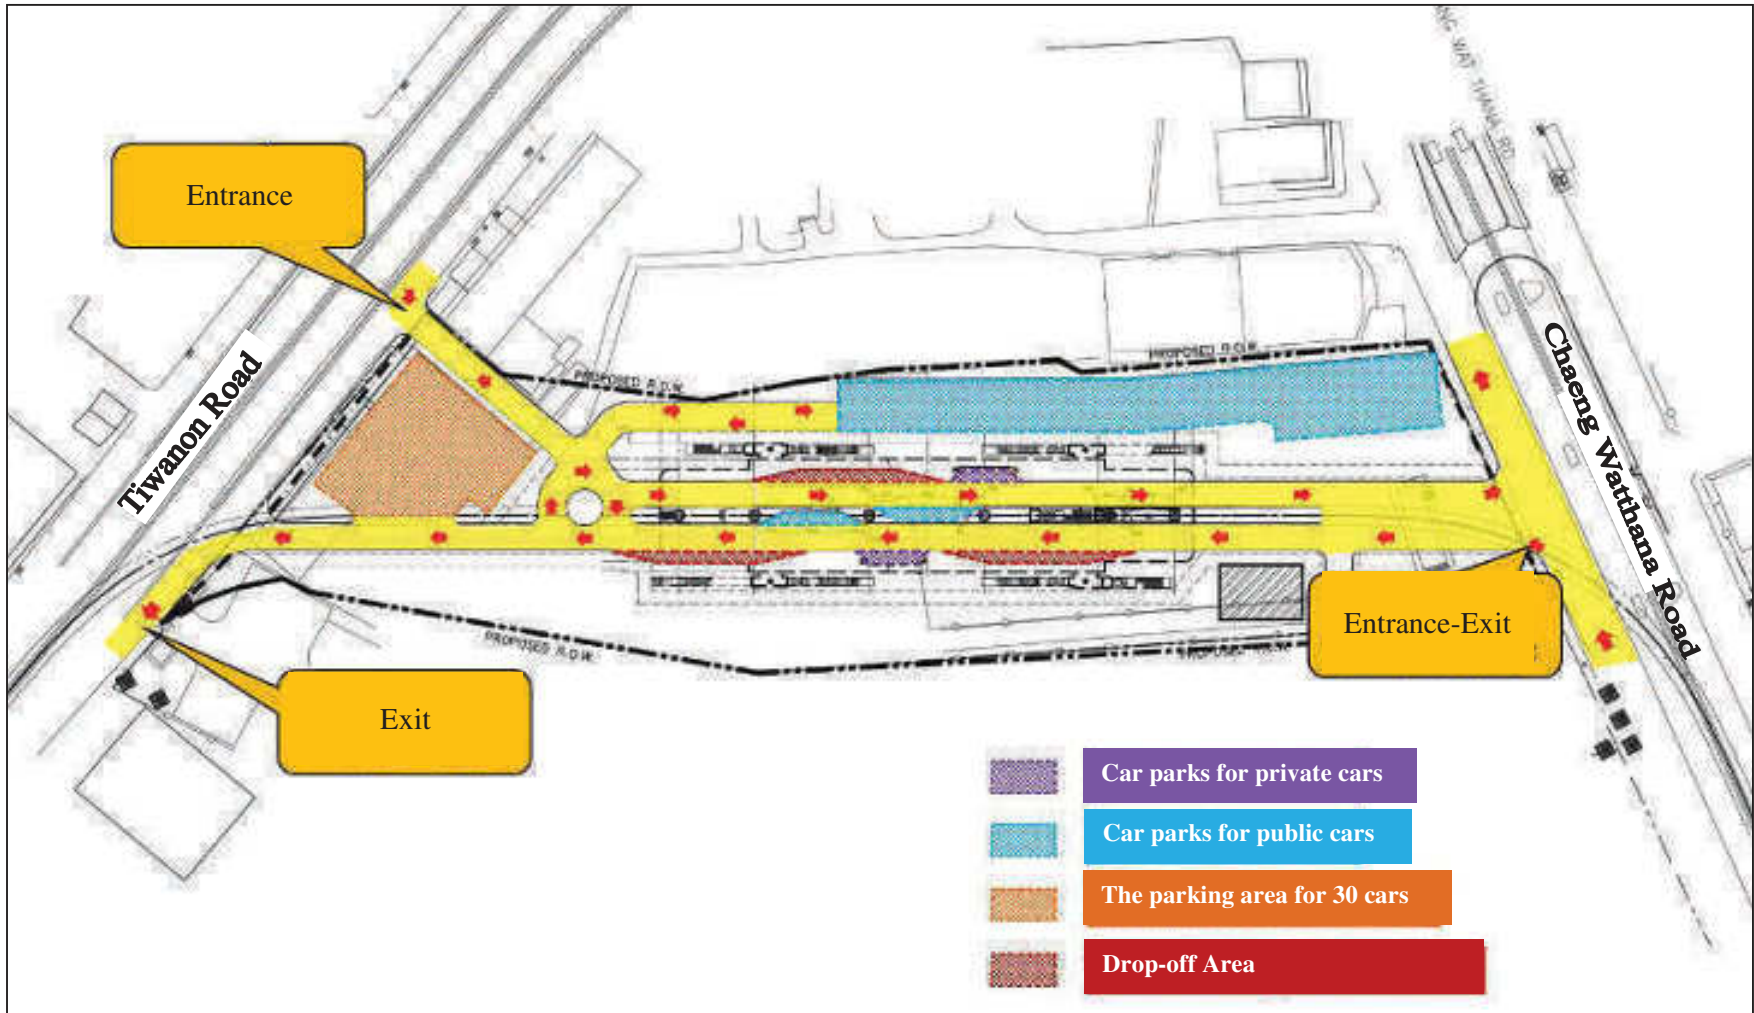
Car Park and Public Car Park at PK06 Pak Kret Station
